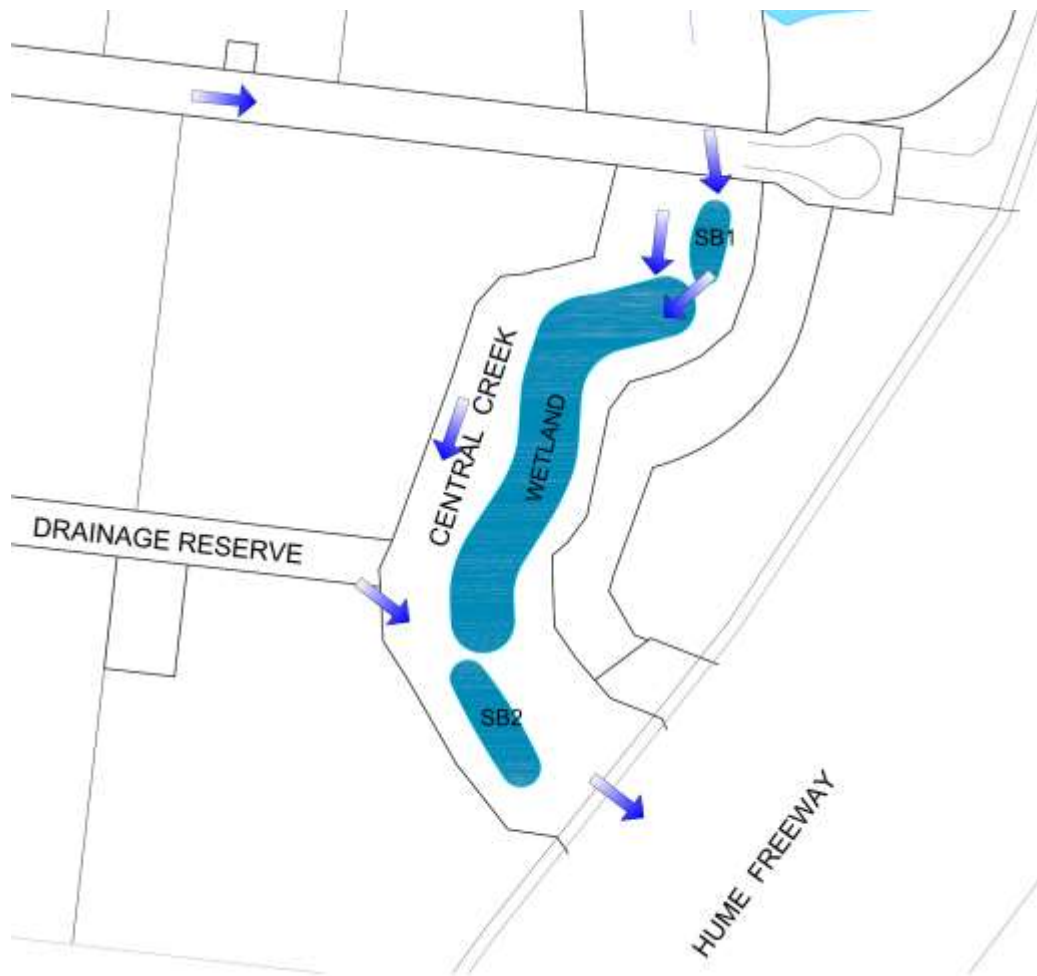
Proposed Treatment Layout for 481 Cooper Street Epping
